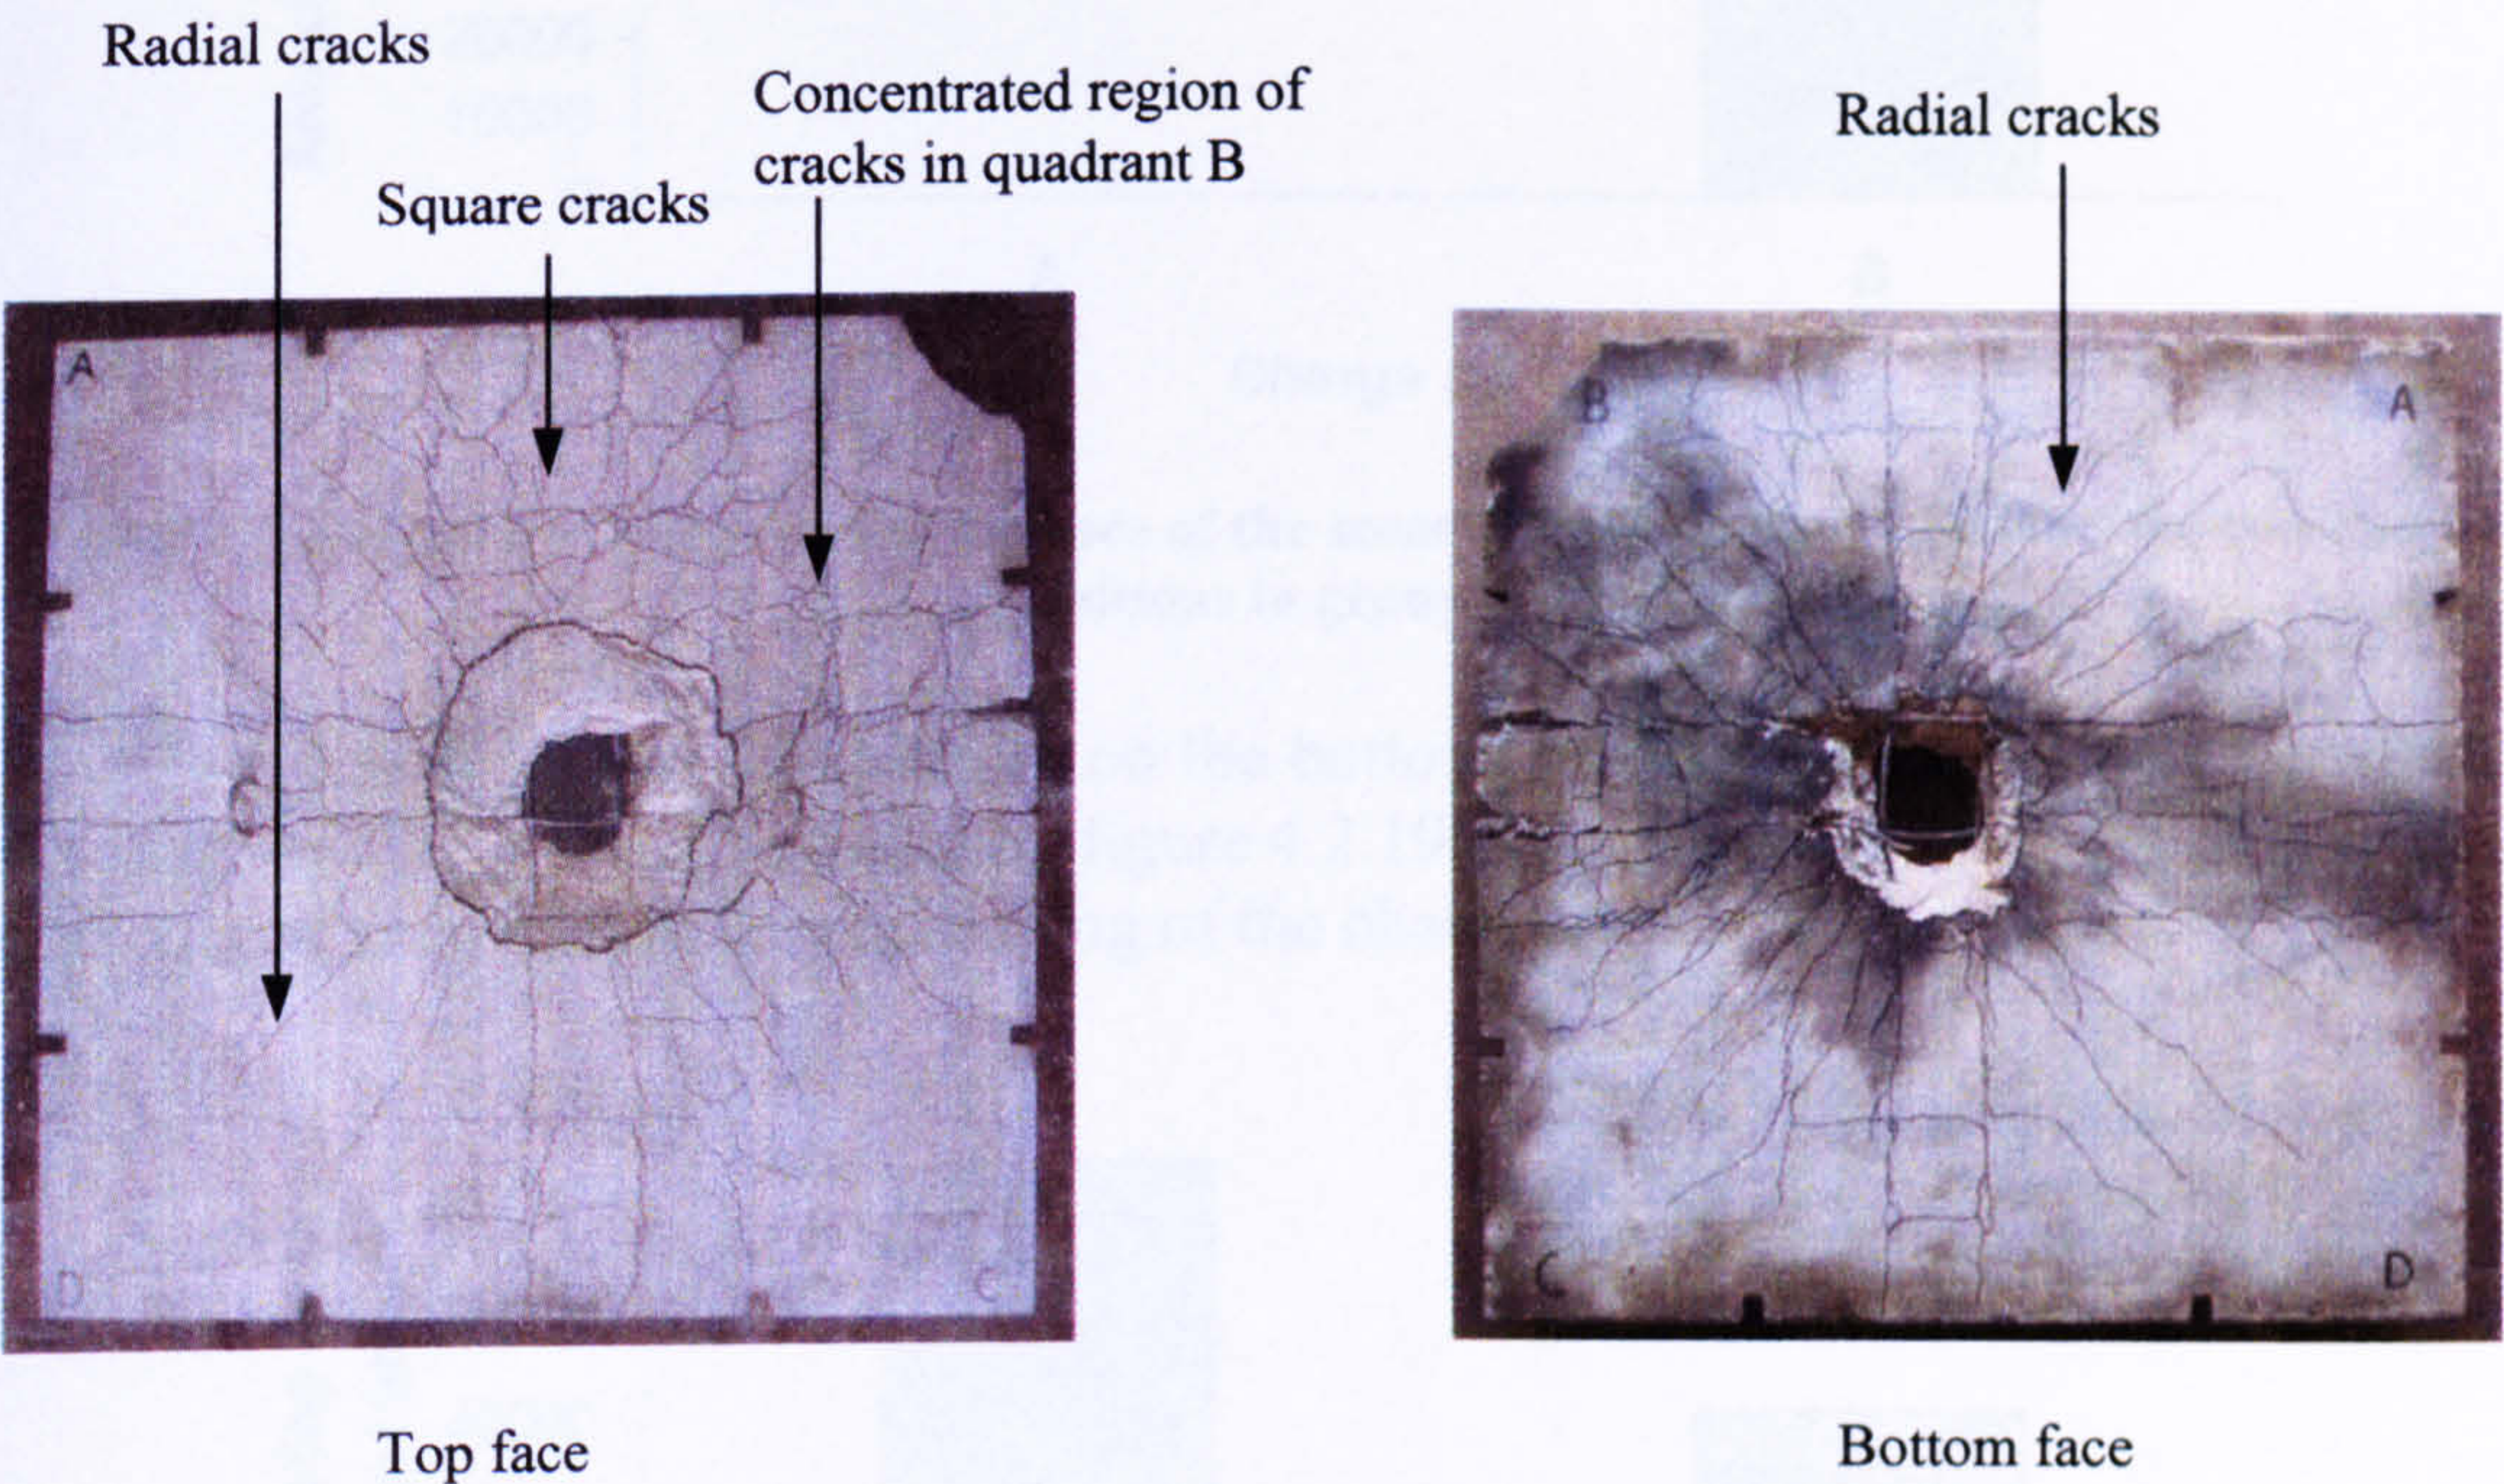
Top and bottom faces of secondary slab RCB73IT13
